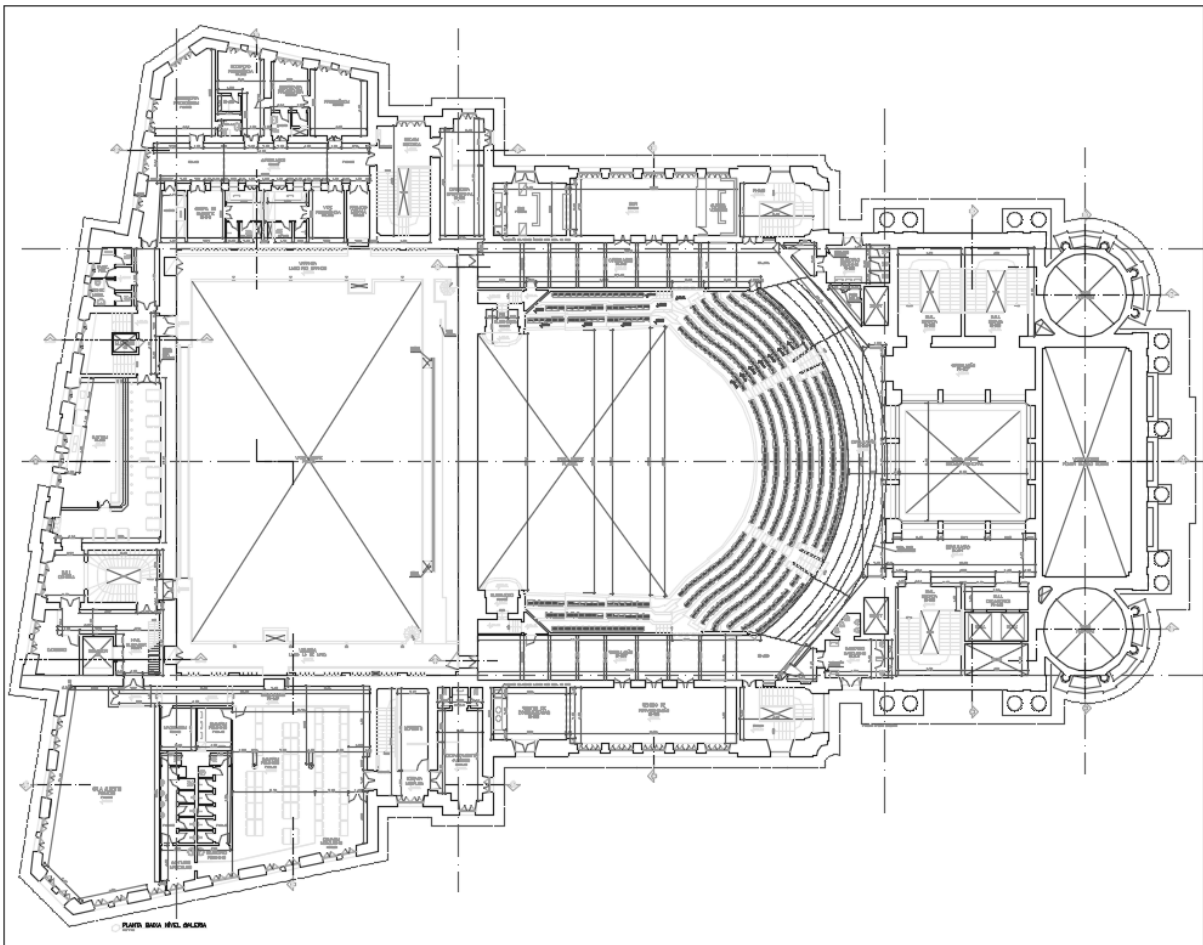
Plan of the Theatre (Adapted from Fundação Theatro Municipal do Rio de Janeiro, 2006)
